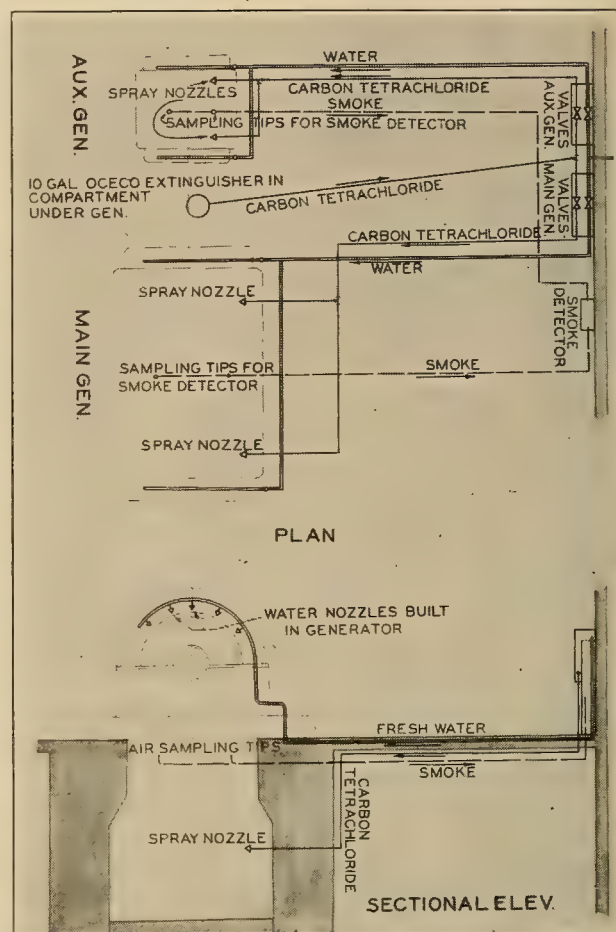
Plan view and sectional elevation showing schematically the built-in fire fighting system on turbo-generator sets.
